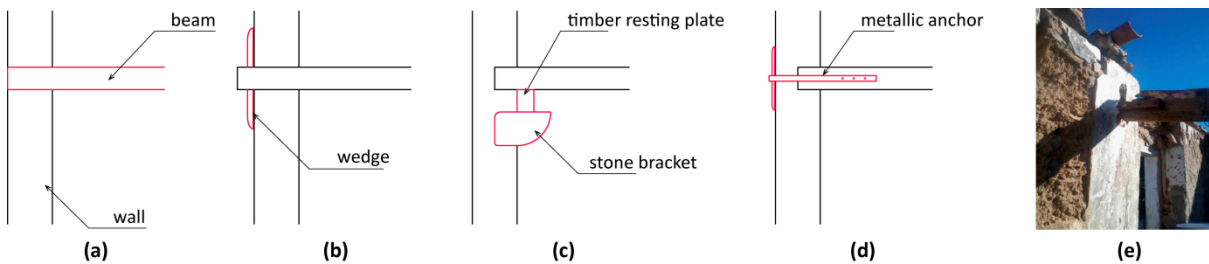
Different types of reinforced floor/roof-to-wall connections: (a) timber beam resting on the whole width of the wall; (b) timber wedges; (c) timber resting plates and stone brackets; (d) metallic anchoring devices; and (e) roof timber beam strengthened with metal bracket in Melides, Portugal (photo by CI-ESG 2013)
